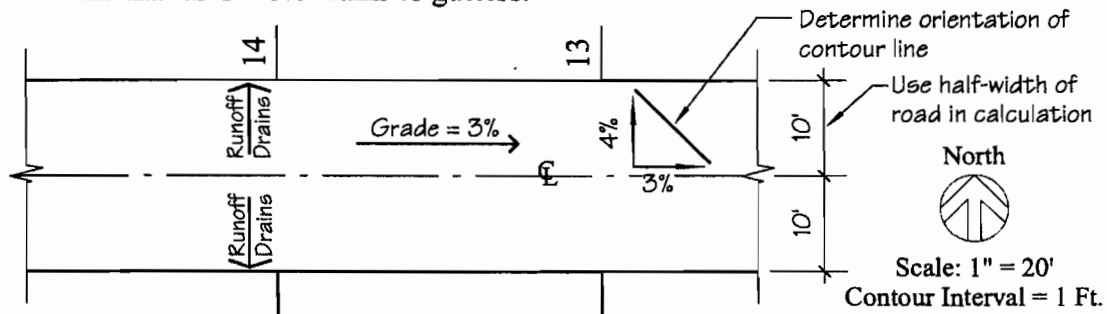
Grading Concrete Road with 4% Cross Slope About Its Crown
